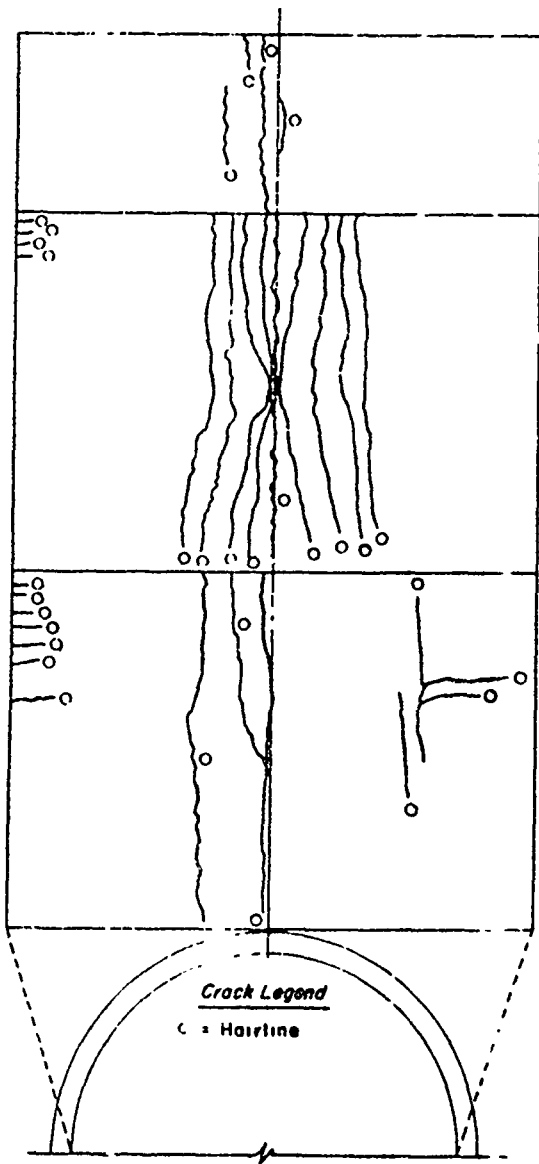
Crack survey of top half, developed; concrete Conduit 3.21.
